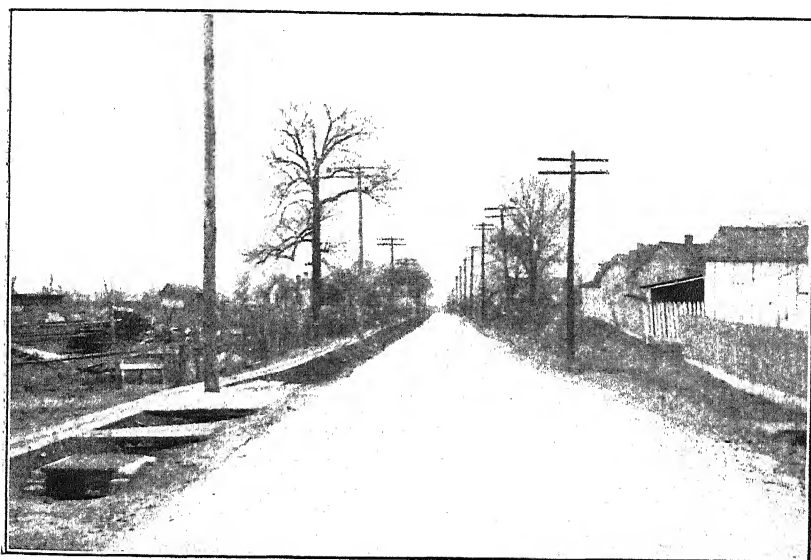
POPLAR CORNER ROAD, BUILT JUNE, 1901.
